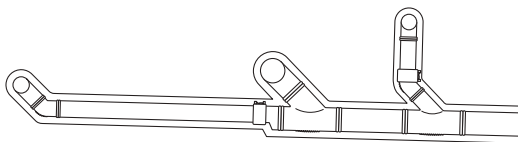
Sound decoupling of branch discharge pipes built into the wall with insulation
